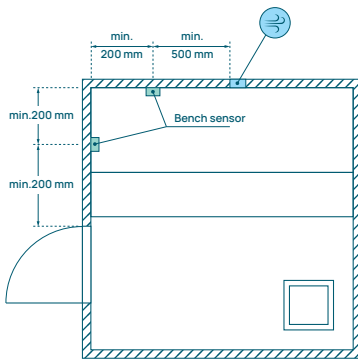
Installing the bench sensor on the wall to the opposite side/corner of the heater
